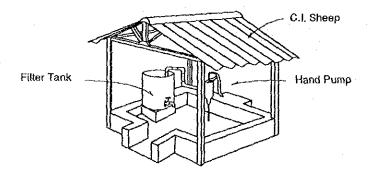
(2/2) Image Sketch of Structures, Buildings and Facilities
